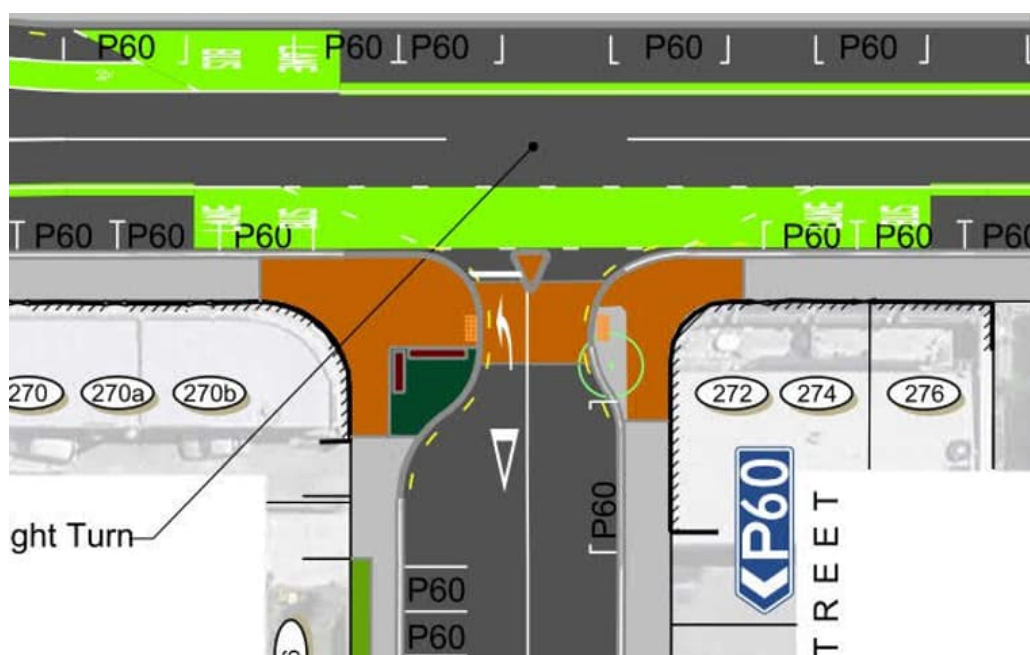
Example green surfacing layout at intersection from Section 1 plans
